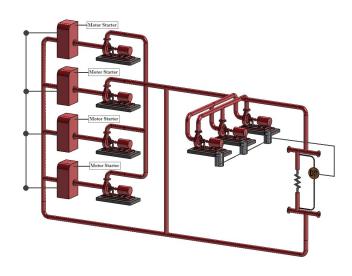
CONVENTIONAL PLANT LAYOUT.
